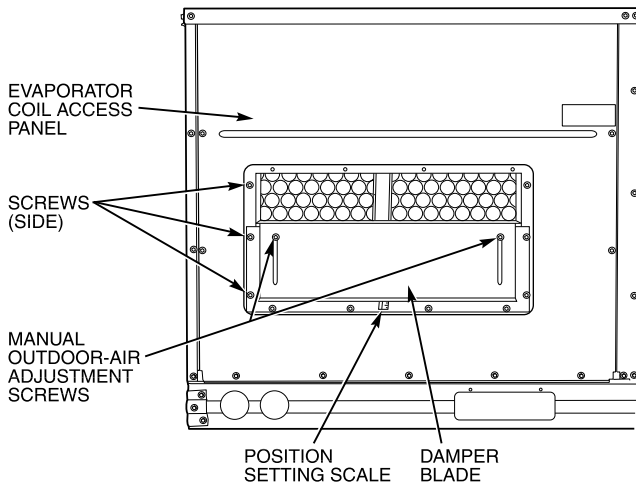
Damper Panel with Manual Outdoor-Air Damper Installed
